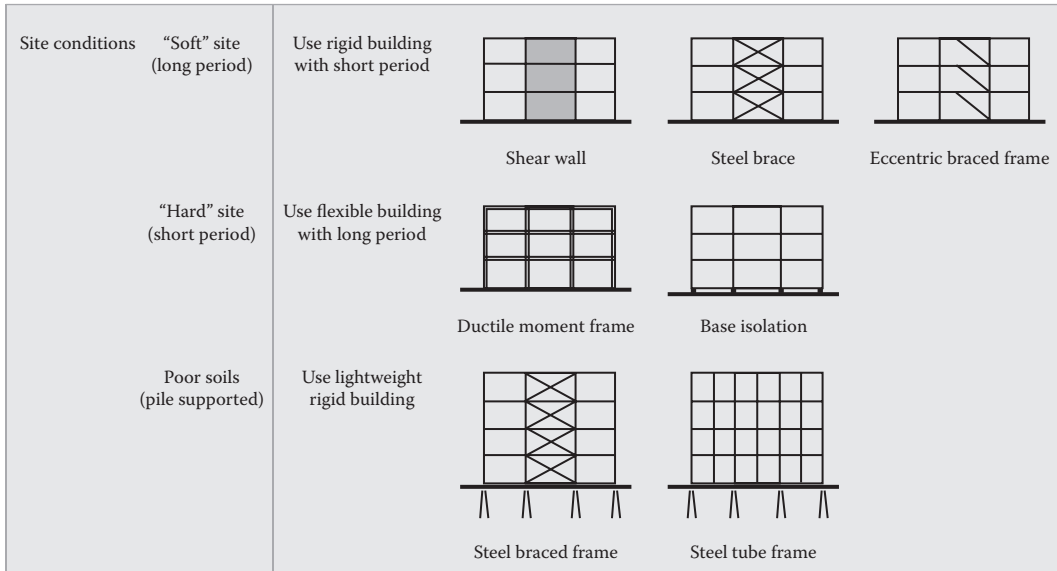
Example structural systems for site conditions. (From FEMA-389, Primer for Design Professionals: Communicating with Owners and Managers of New Buildings on Earthquake Risk. Washington, DC: Federal Emergency Management Agency, 2004.)
